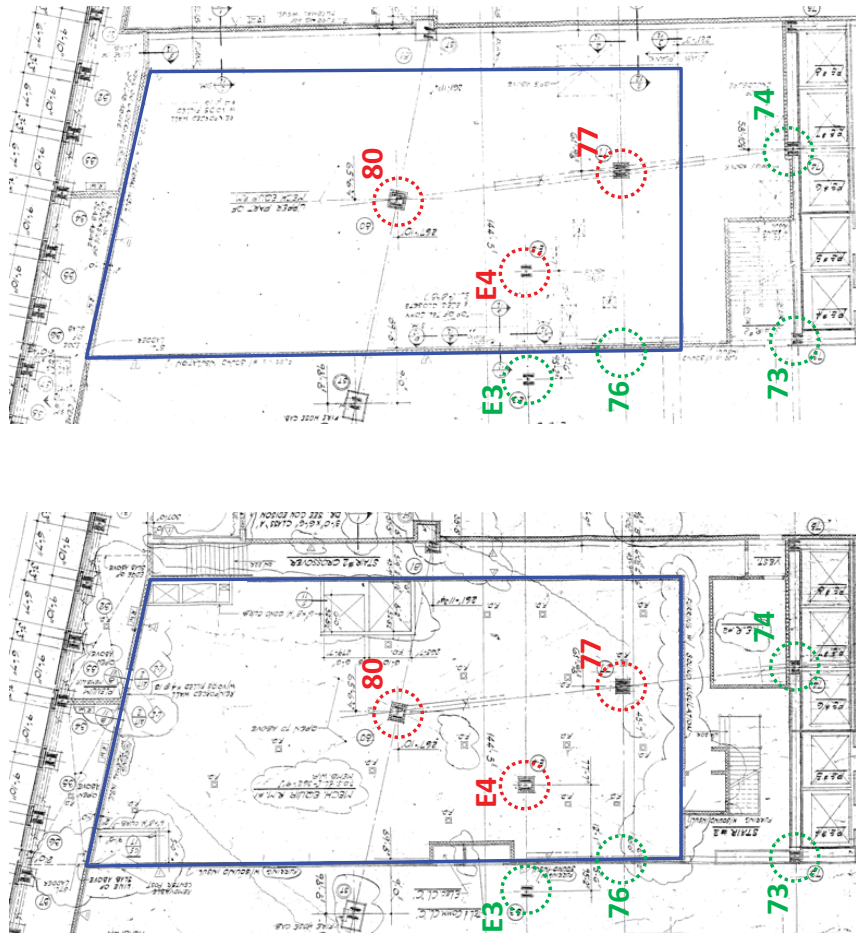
Detail of the structural drawings corresponding to the Mechanical Room for the (a) 5th Floor and (b) 6th Floor.
